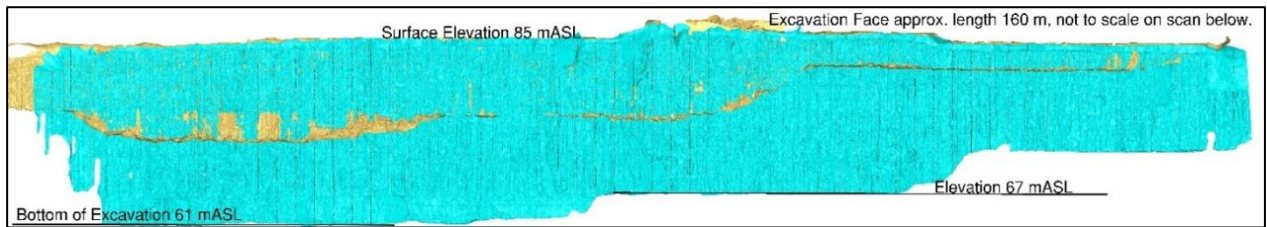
LiDAR scan of north excavation face PWC. Joint locations and facial distortion may be analyzed by inspection.
